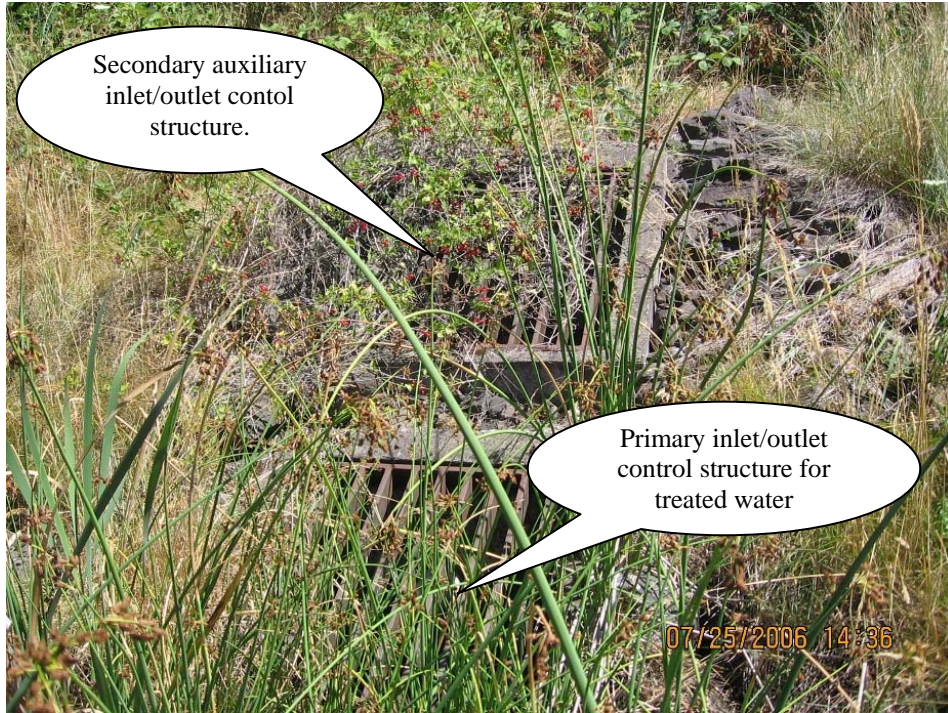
WQ Extended Dry Detention Pond Control Outlet Structure
